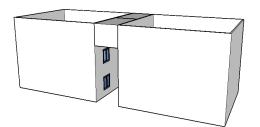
Two bridged rooms may be built to connect between two houses. This treatment has the advantage of shading the setback and the rooms may be used for the family. (Source: the author)
